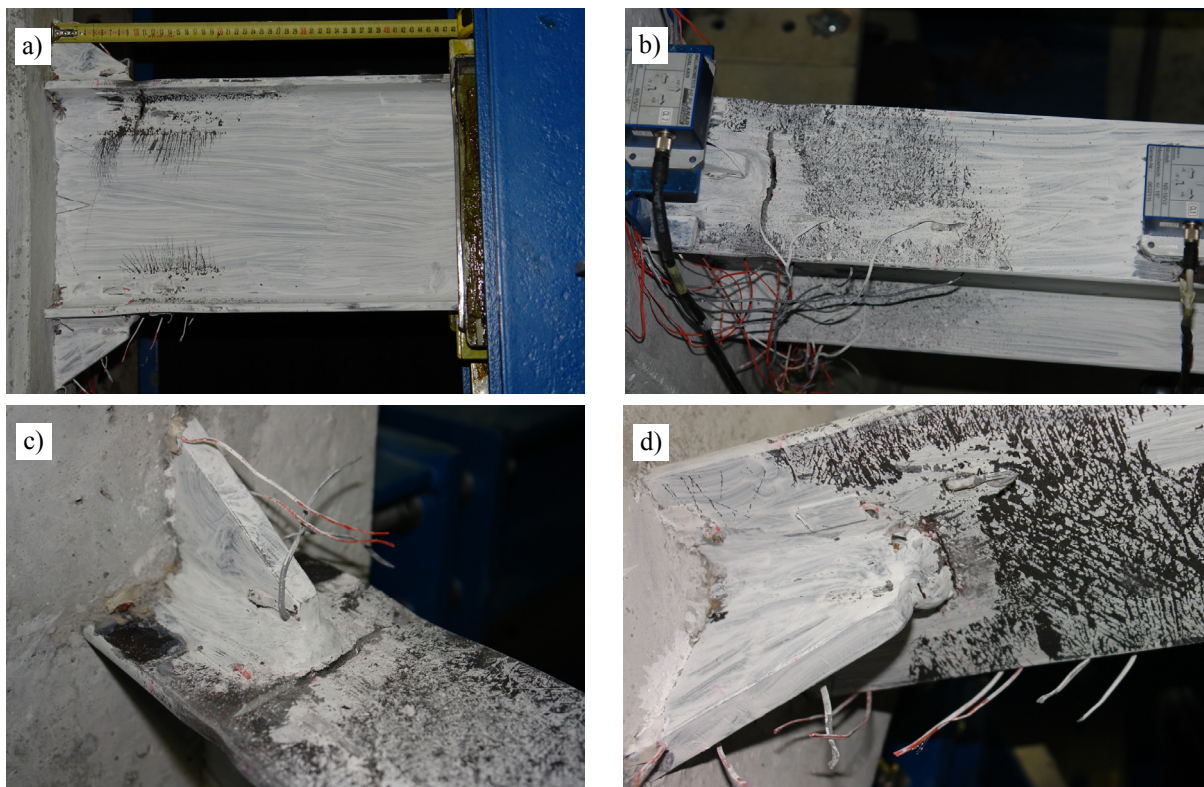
Specimen RS1.3 after the test: a) local strained area of the beam just after the stiffened section, b) fracture of top beam flange, c) crack on top beam flange, side view, d) damaged bottom beam flange
